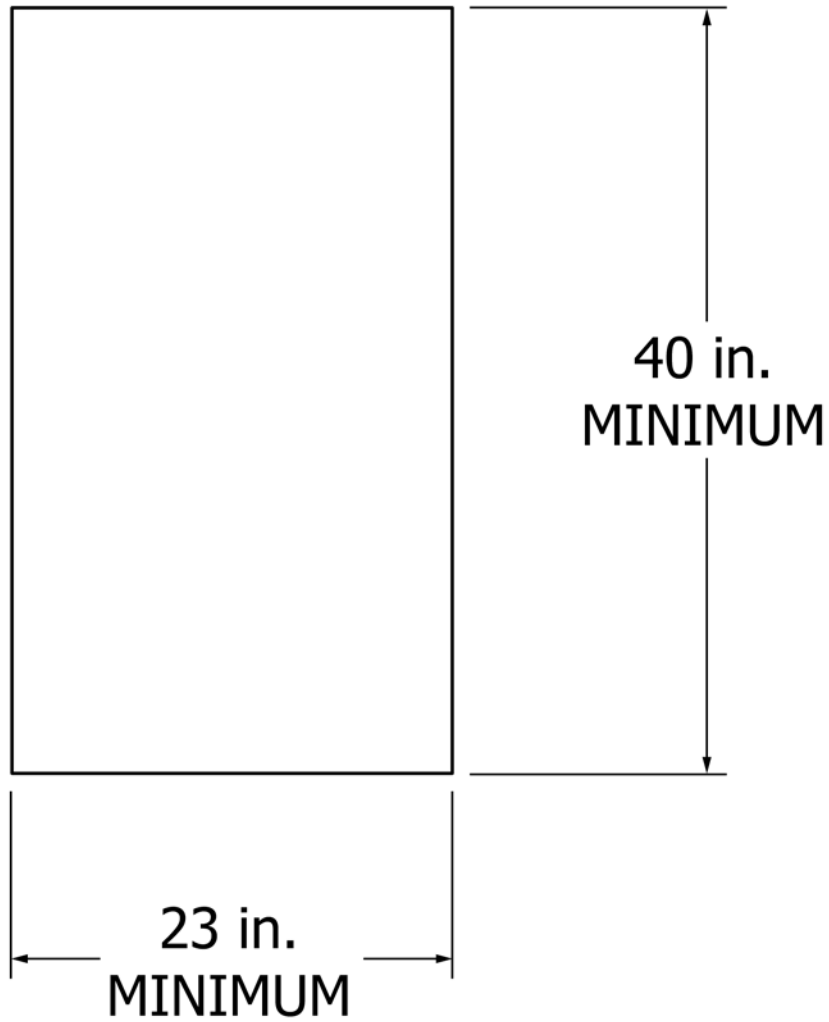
Rectangular Dead End Cross Section Elevation View
